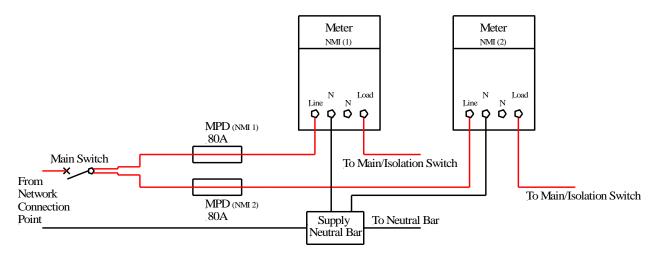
(a) to (d) provide examples of metering connection arrangements. Other arrangements may be used. MP should be consulted prior to the use of an alternative arrangement.
